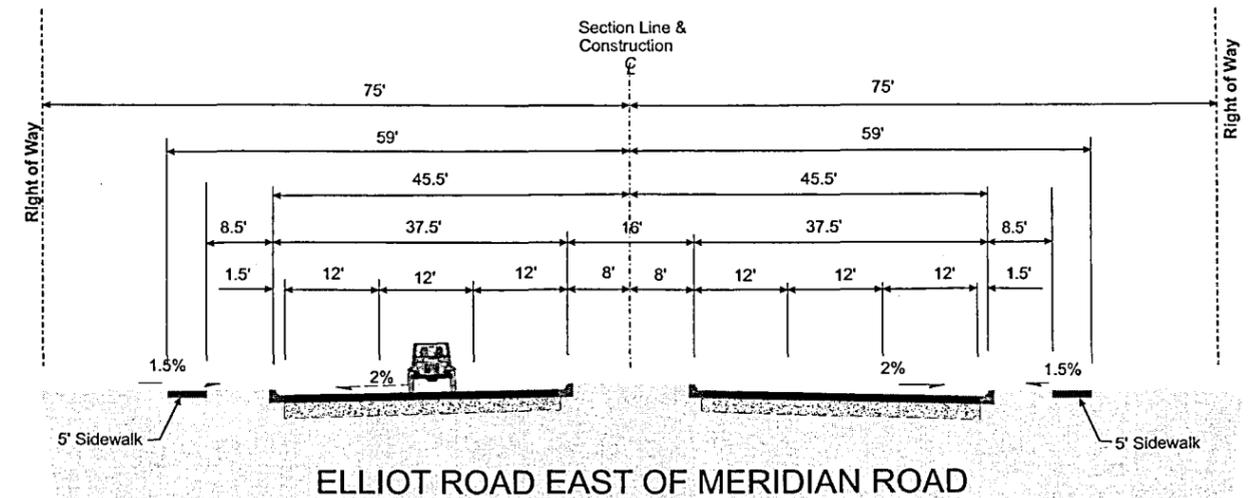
Typical Roadway Cross-Section: Meridian Road to CAP Canal
